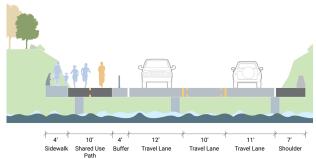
Alternative 2 - Existing and Proposed Cross Sections
